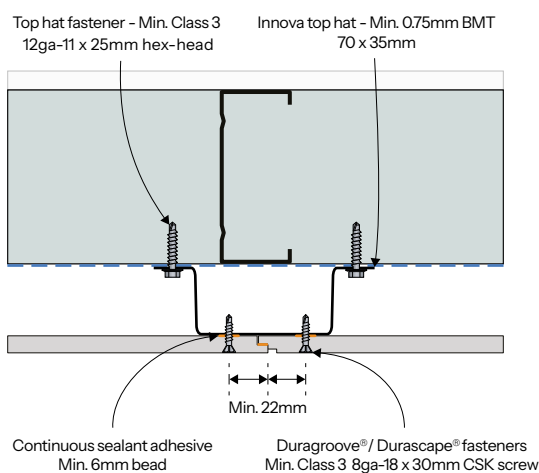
Steel frame - cavity fix (35mm) fastener detail Plan
